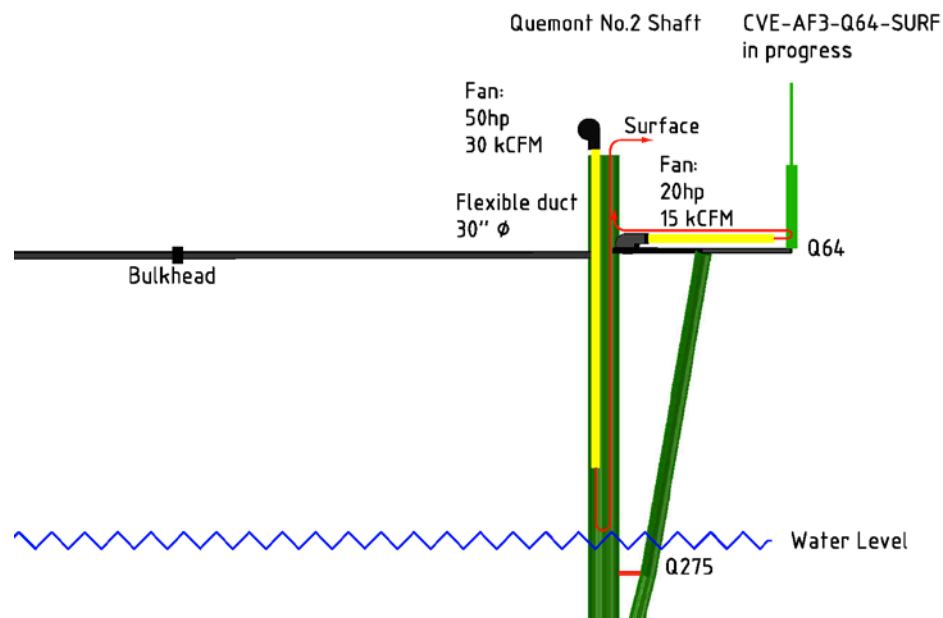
Dewatering and rehabilitation ventilation – step 1
